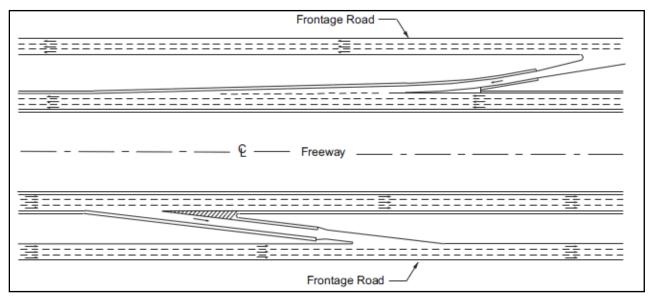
Intersections between ramps and one-way frontage roads (AASHTO 2011).
